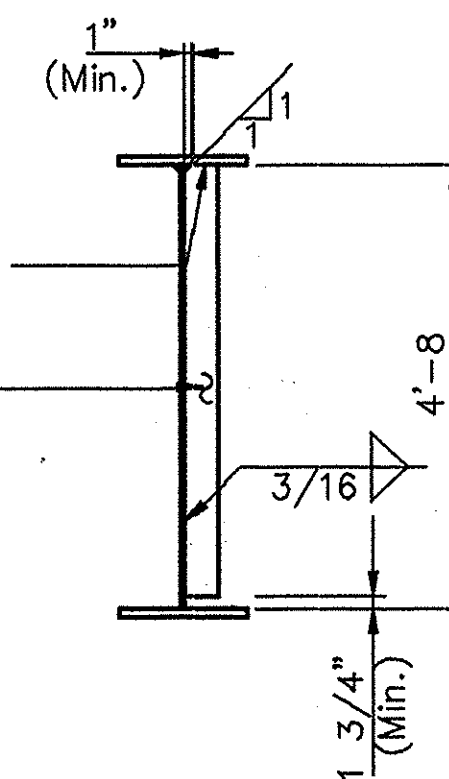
DETAIL "B" CONNECTION R ATTACHMENT @ COMPRESSION FLANGE
